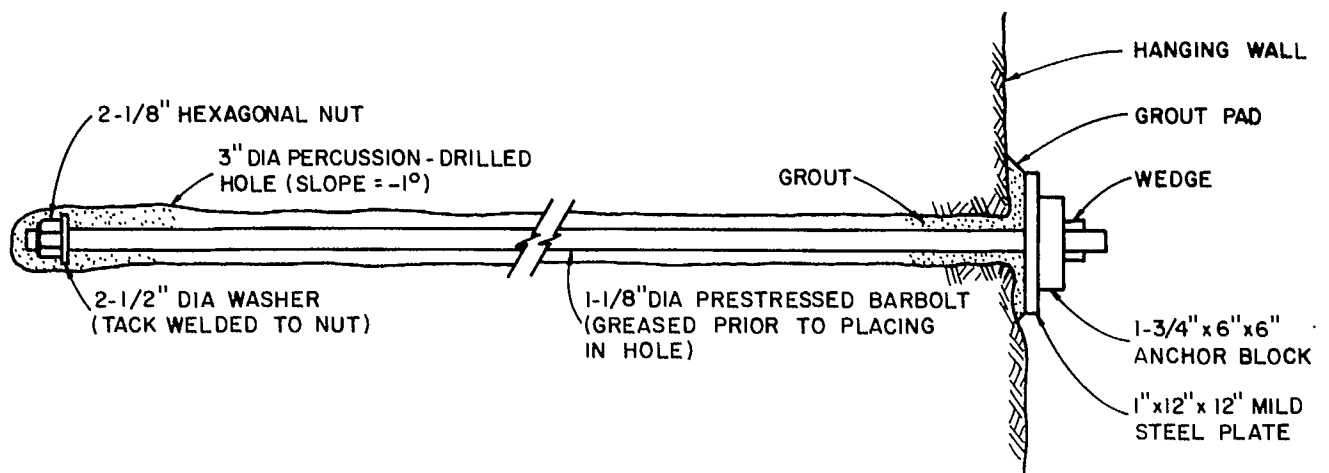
Solid Bar Rock Anchor Used in a Canadian Underground Copper Mine (9).
